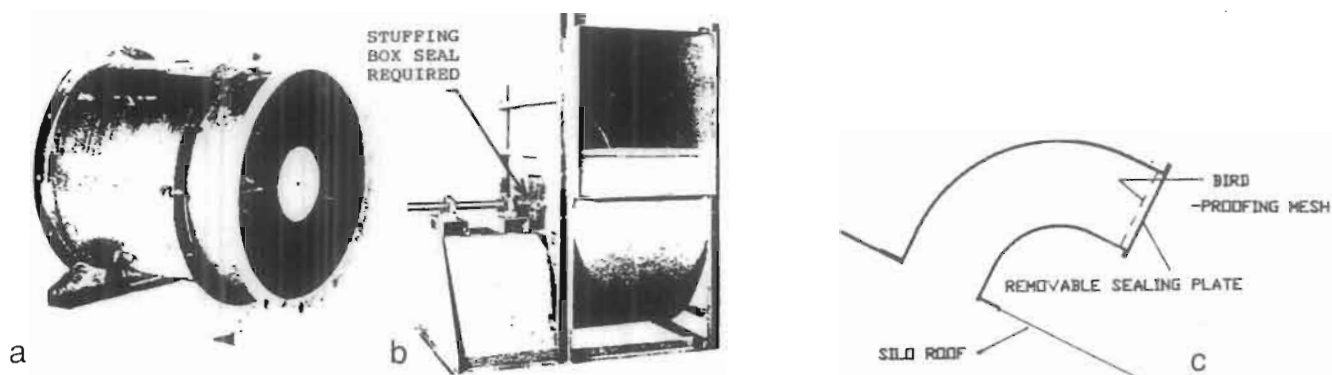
Sealing fans and ventilators: (a) axial fan; (b) centrifugal fan; (c) ventilator.
